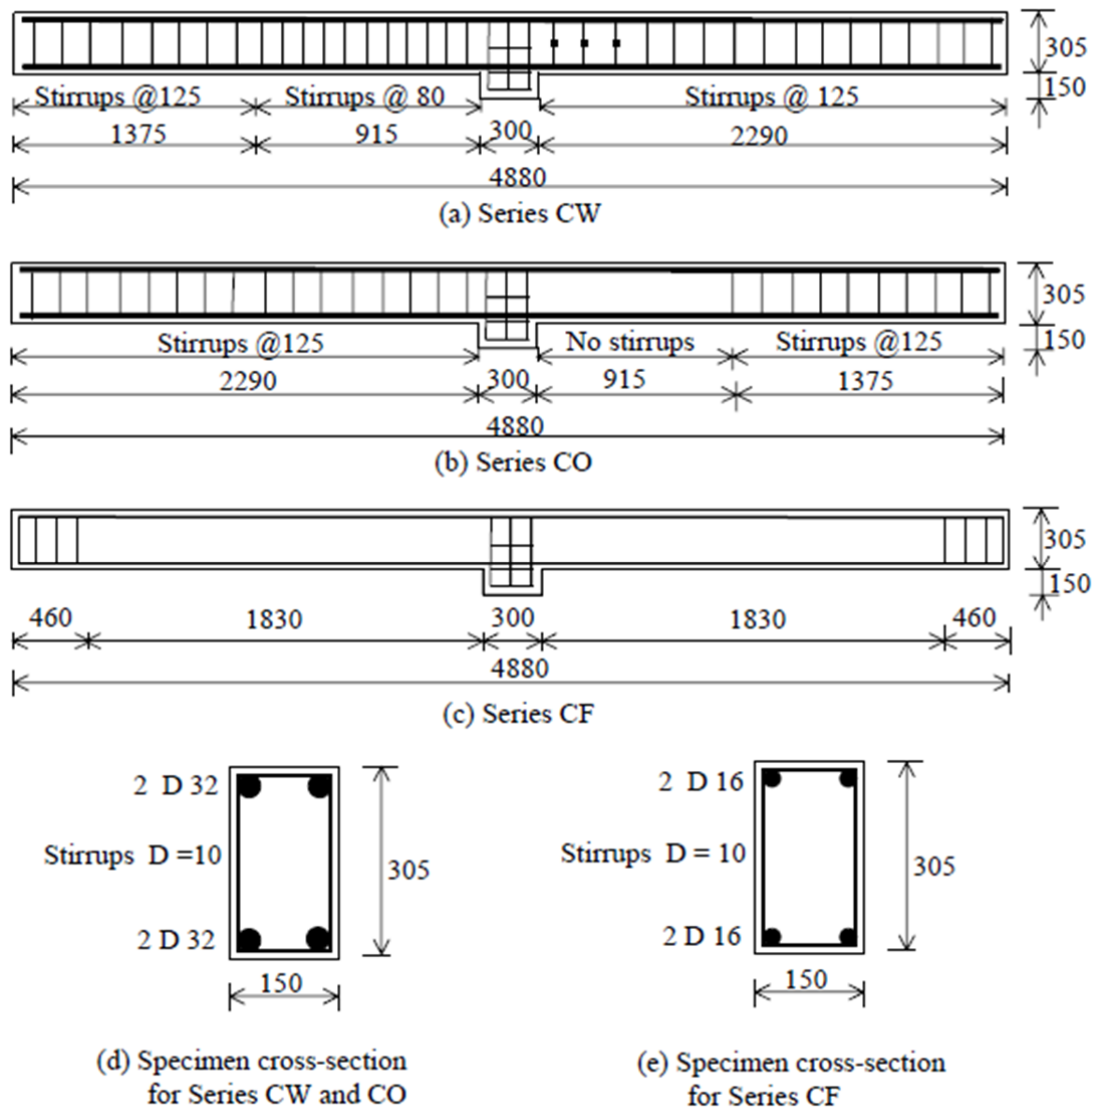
Two-span continuous beams (dimensions in mm) (Khalifa et al. 1999)
